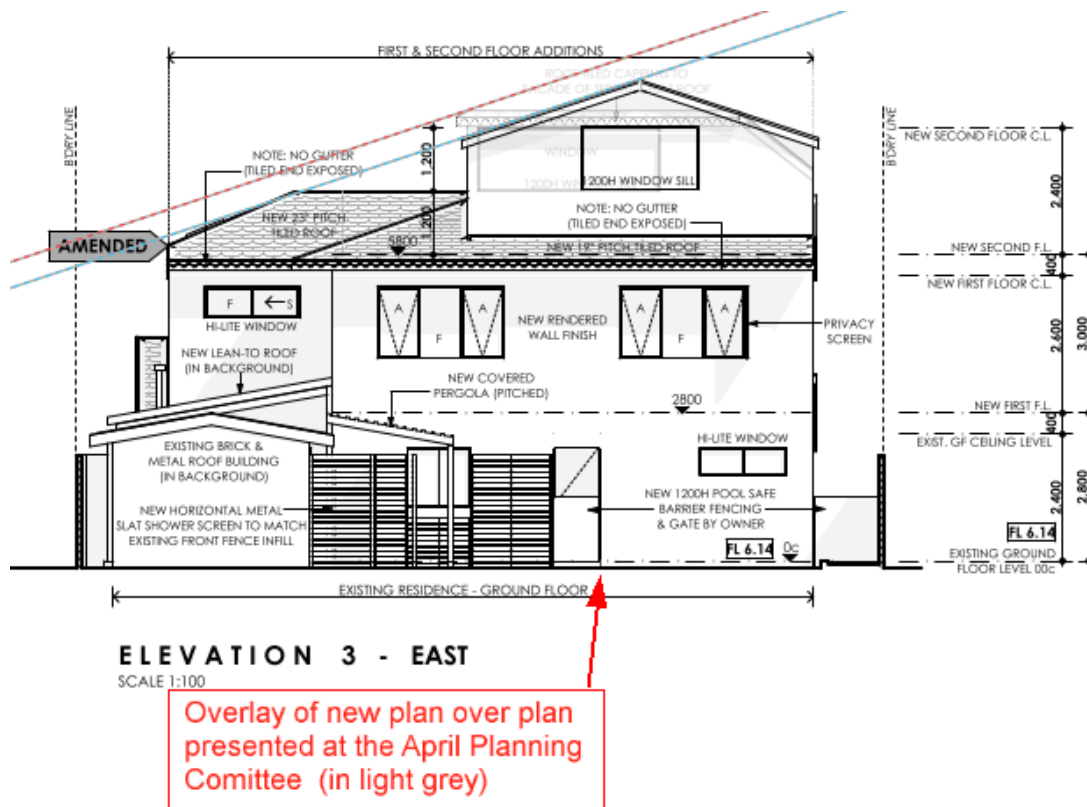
Proposed east elevation showing change to roof form and pitch at third level
